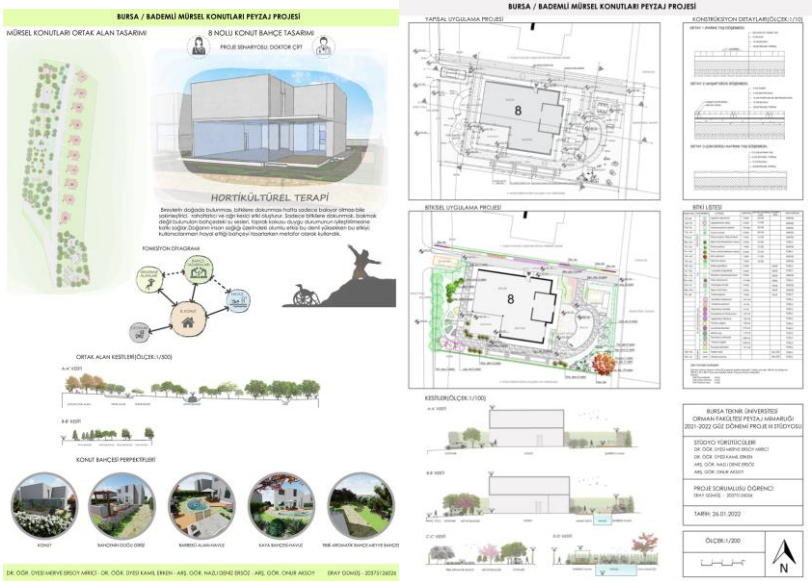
Concept Approach and Technical Drawing Sheets (Eray Gümüş)
